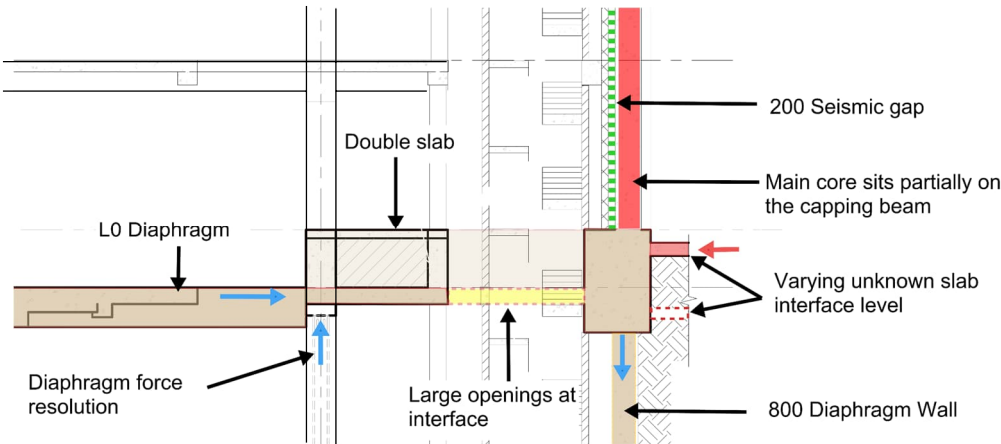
L0 Diaphragm Interface in Section (Detail from Fig. 3)
